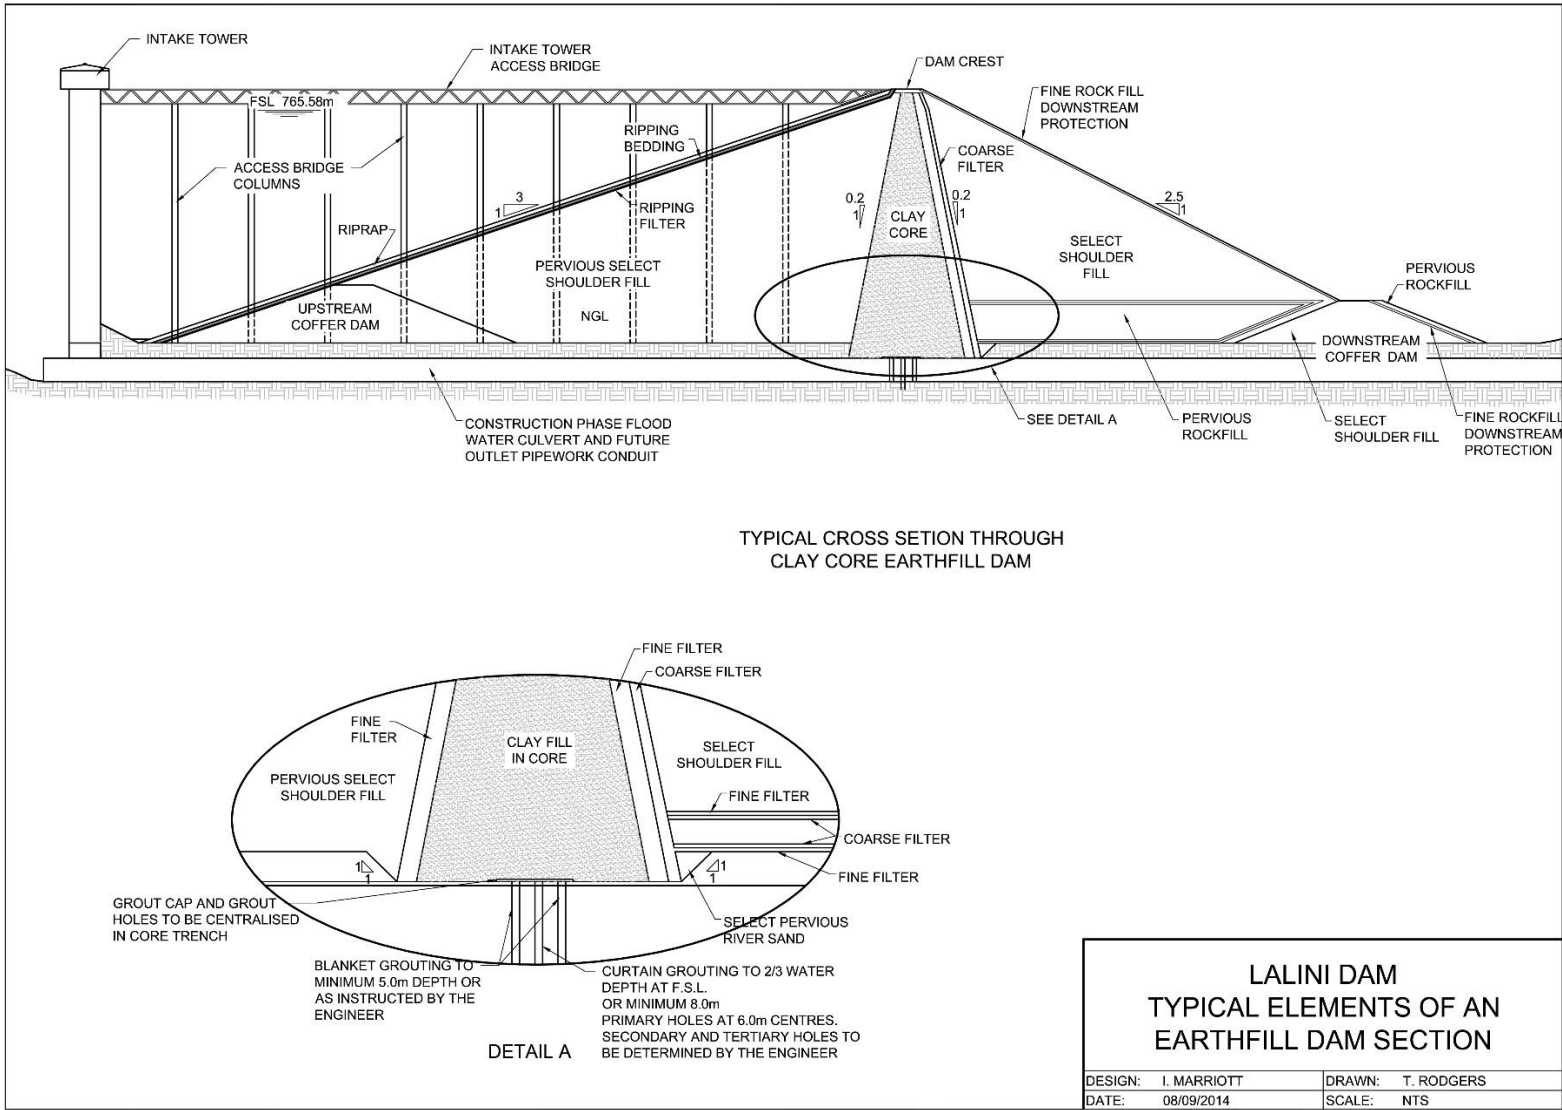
Typical Sections and Details for EC Earthfill Type Dam
